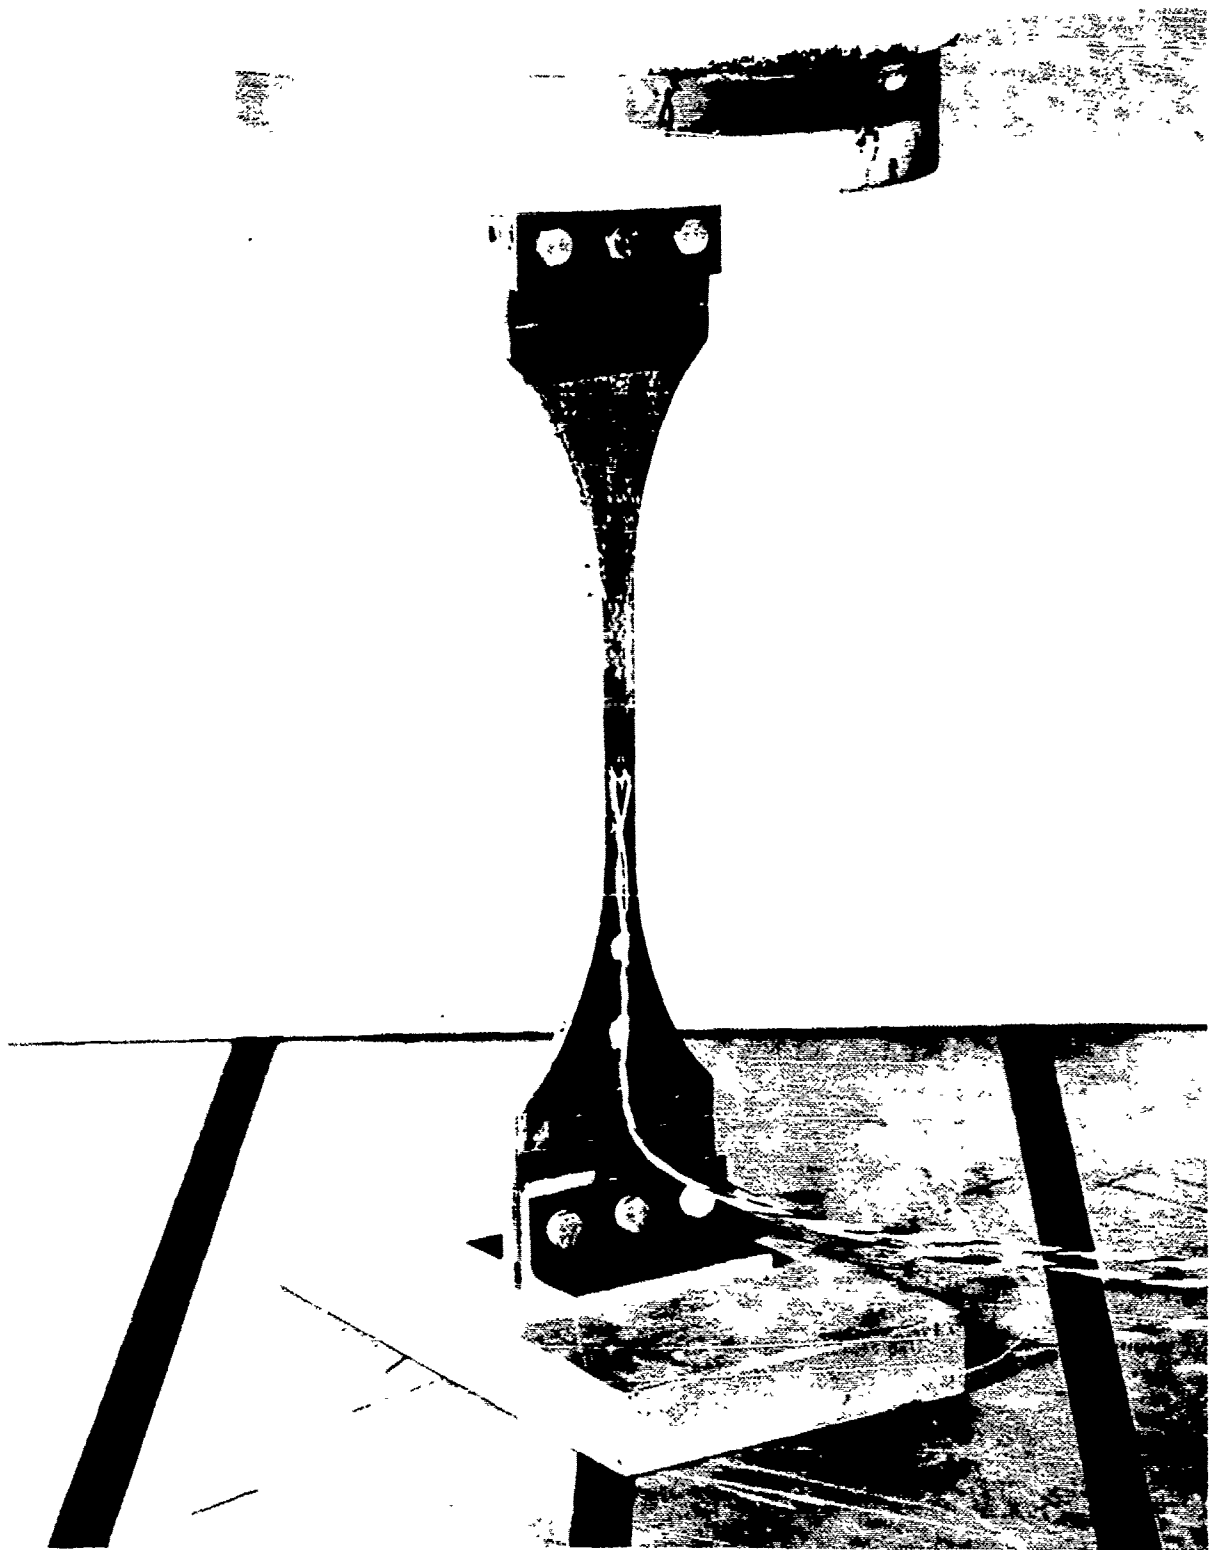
CUTOUT TRUSS WEB ELEMENT COMPRESSION TEST SETUP
